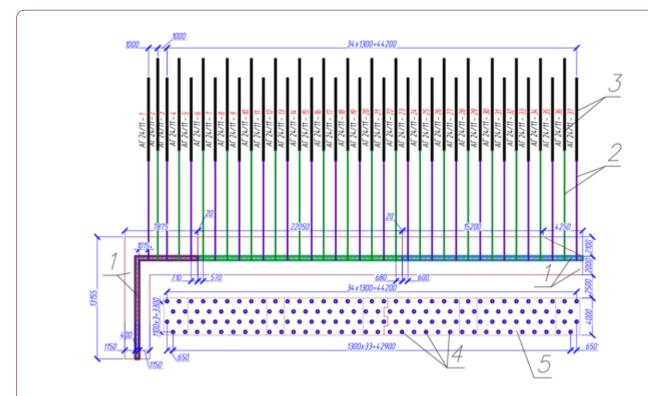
Scheme of the device of monolithic reinforced concrete rostwerks and diaphragms at the final stage: 1 - the existing monolithic corner reinforced concrete rostwerks; 2,3 - ground anchors ERT (2 - anchor rod; 3 - anchor root); 4 - drill-injection piles of ERT strengthening of the base; 5 - monolithic reinforced concrete rostwerk.
